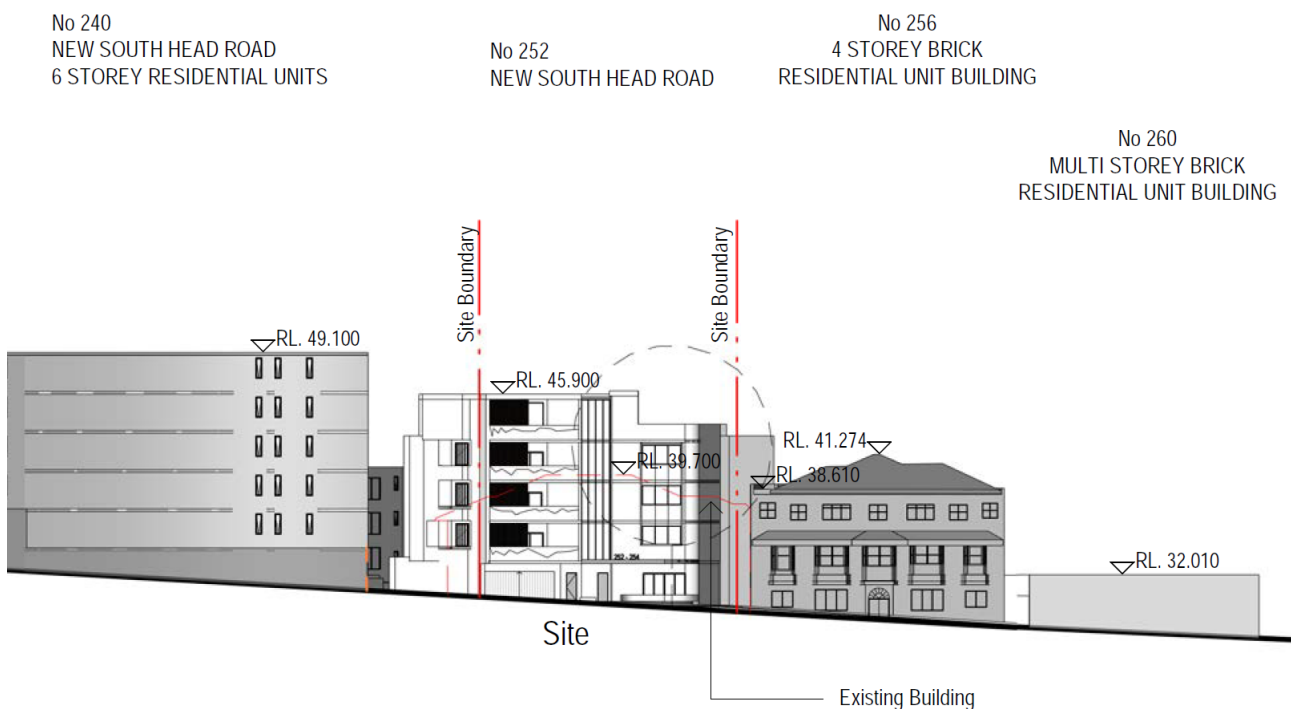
Streetscape elevation (Source: Antoniades Architects)
